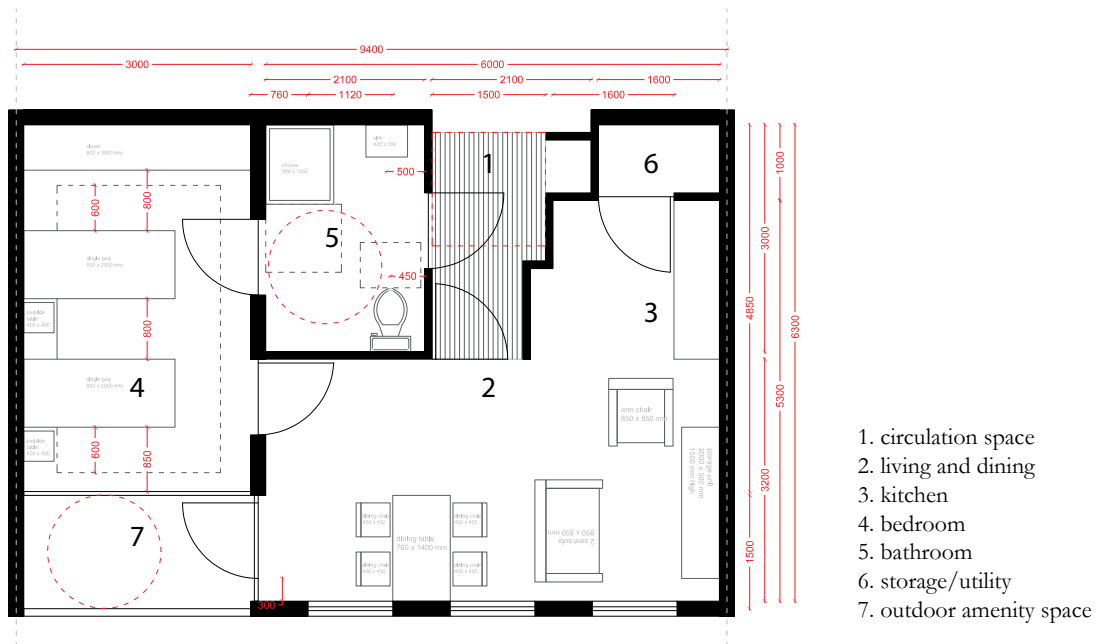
New floor plan (scale 1:100) and organization scheme of the 1b2p-flat
